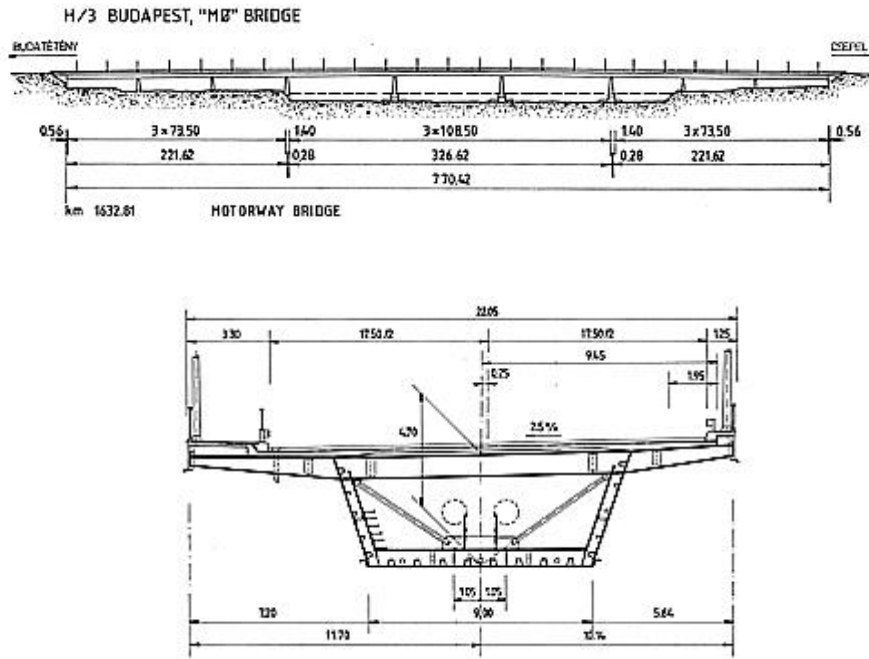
The general layout and the general cross-section of the Háros bridge.
